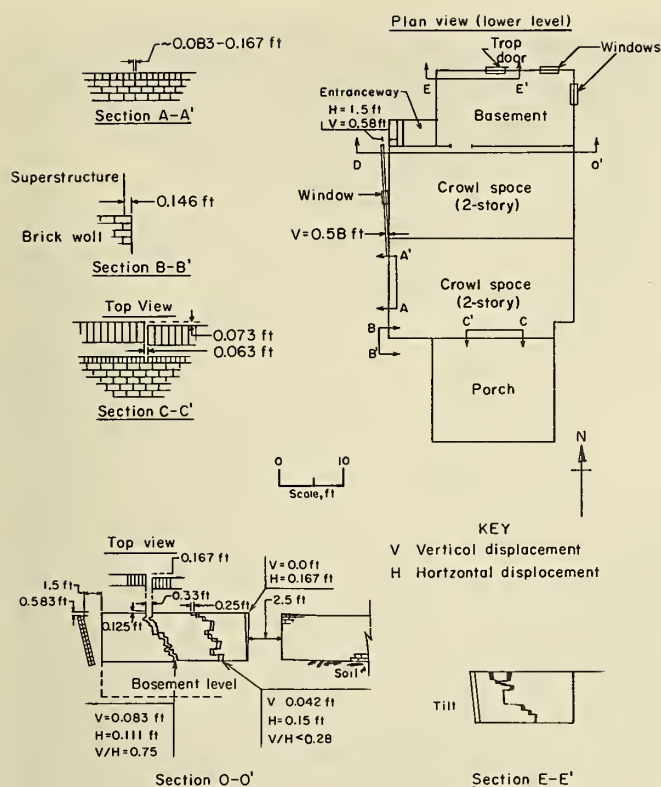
Plan of damage to house C. The damage was measured in May 1978. (Sections shown are not to scale.)
